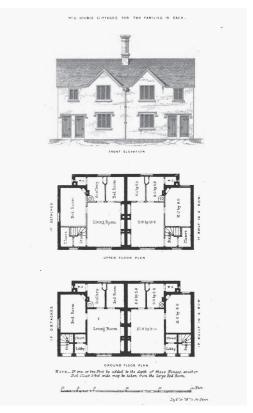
19th Century: plans and elevations for proposed workers' housing, Henry Roberts (1850) • Source: Aureli, 2017
